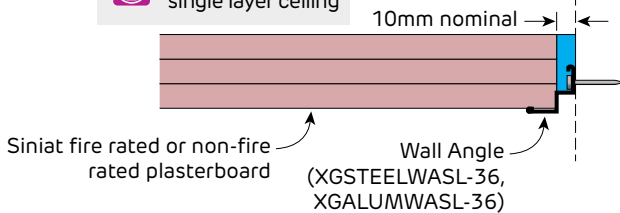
Finishing Detail - Shadowline Wall Angle
